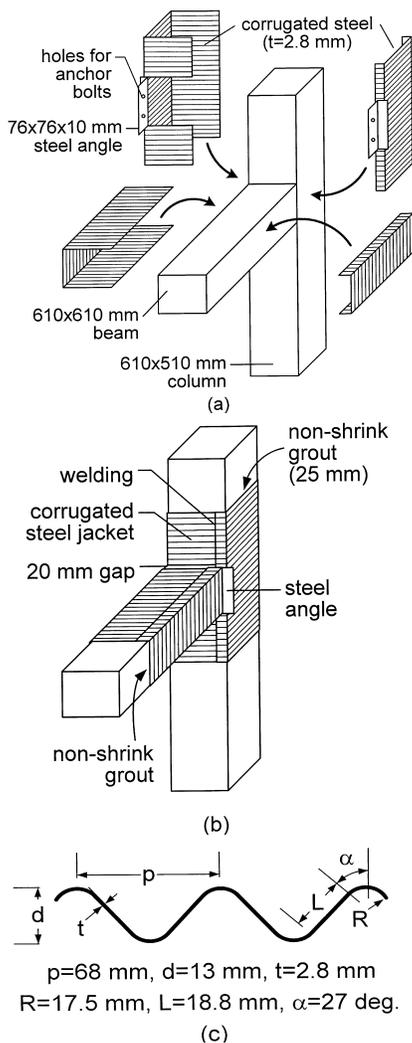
Corrugated steel jacketing technique proposed by Ghojarah, Aziz, and Biddah.^{25,26} (a) before installation; (b) after installation; and (c) cross section of corrugated steel plates.
